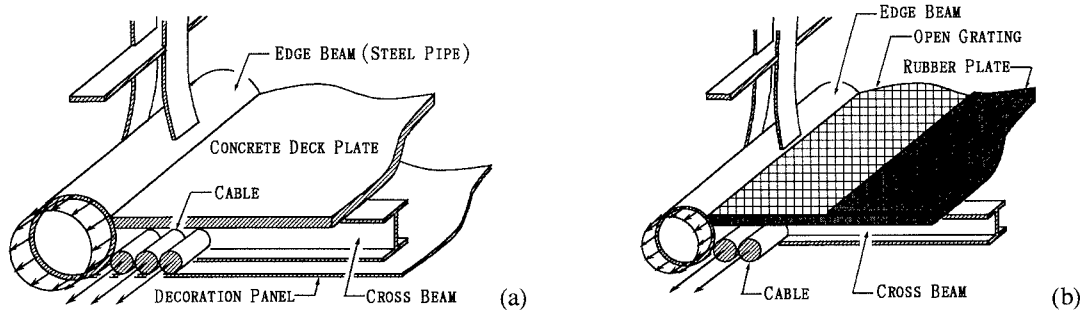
Cross-sections of the previously proposed steel structure (a) and an improved lighter steel one (b).
